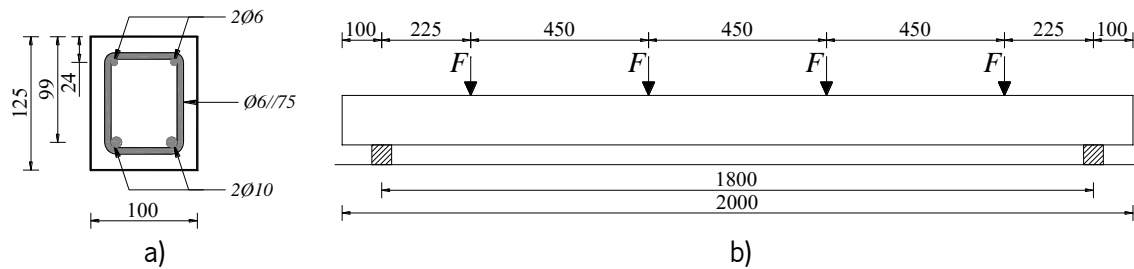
Beam geometry, reinforcement, support and loading configuration (dimensions in mm) [198].
